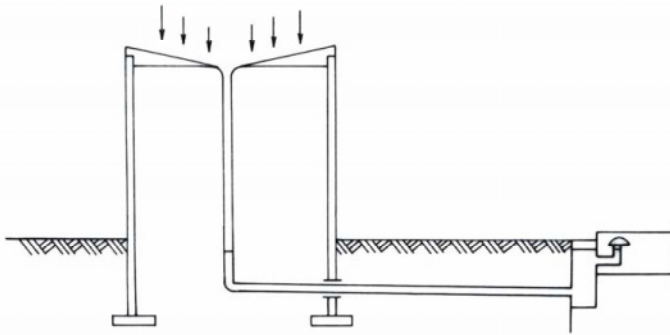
A longitudinal cross-section of rainwater downpipes and their connection to flower box through a collector and manhole
